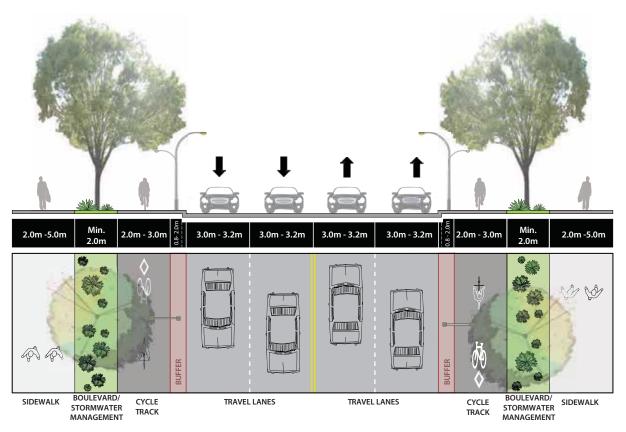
| Mid-term Shelbourne Street Cross-Section
